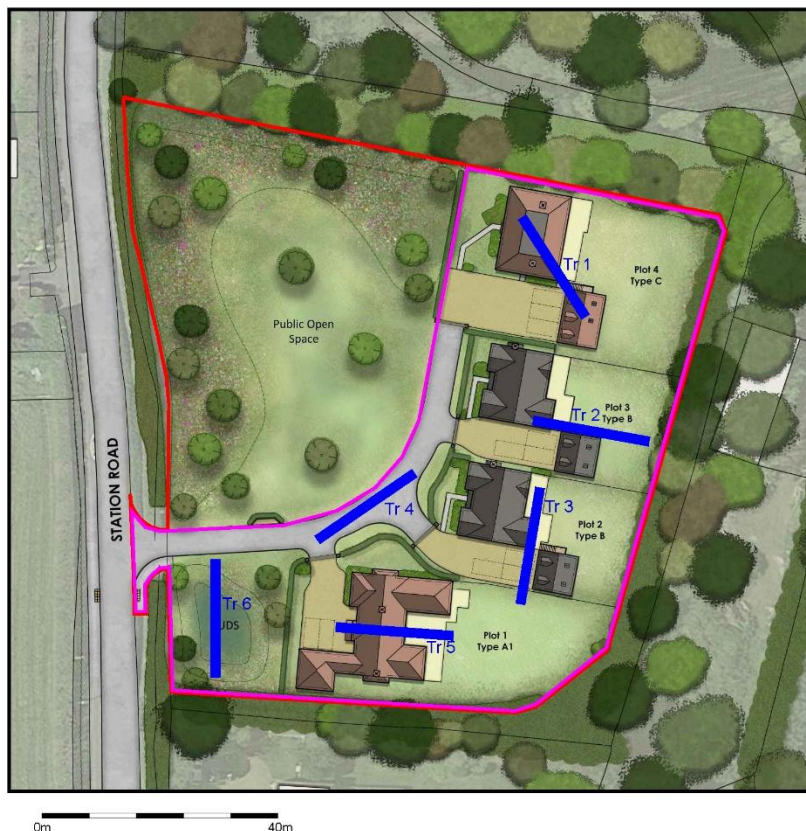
Plan showing locations of trenches in relation to proposed site plan
